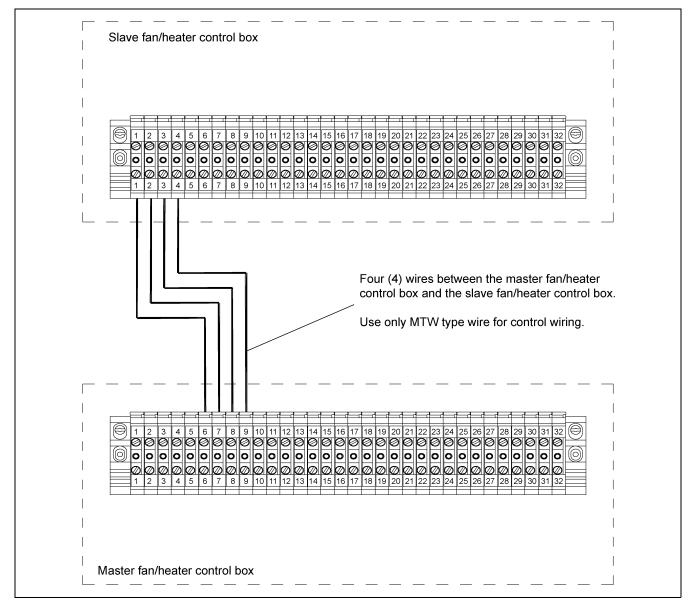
G Wiring for a Slave Fan/heater Unit to a Master Fan/Heater Unit
